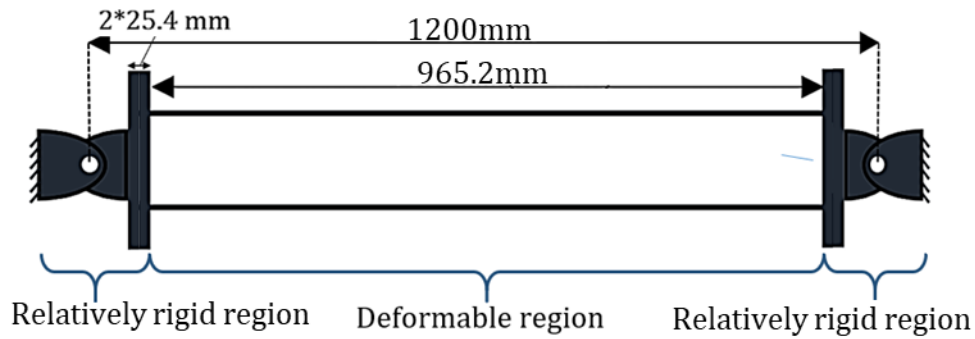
Deformable and Non-Deformable Parts of the Cylindrical Specimen (Davari pour et al., 2020a)
